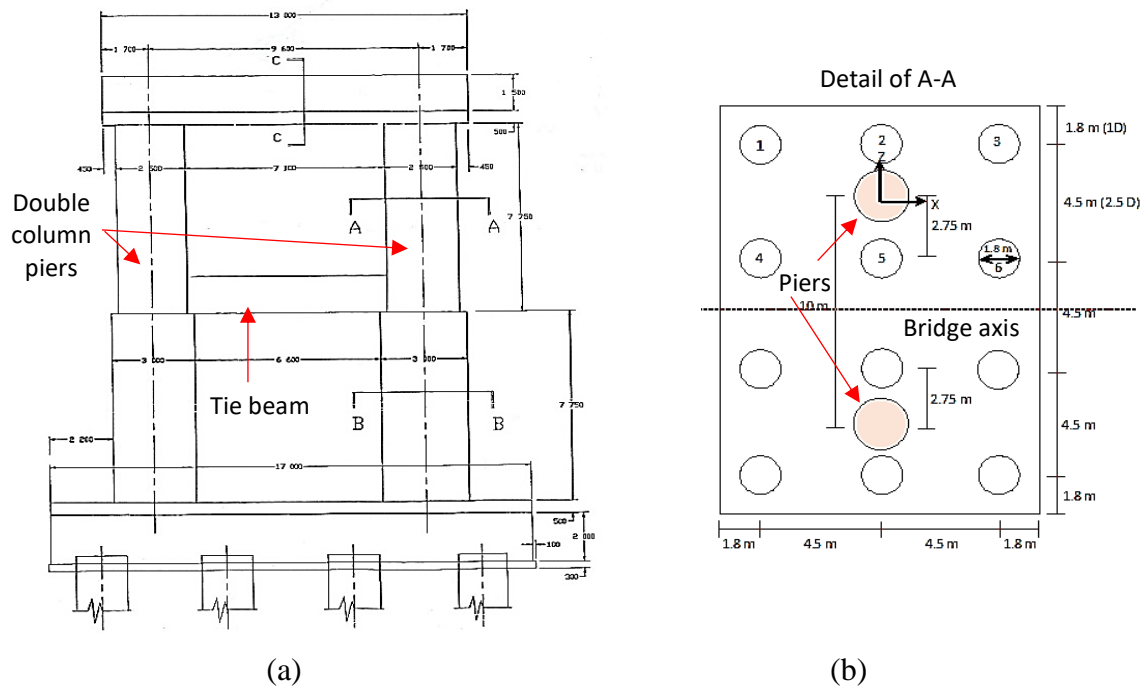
(a) Double column pier P5 ~ P7; (b) Pile cap under pier P5 ~ P7.
